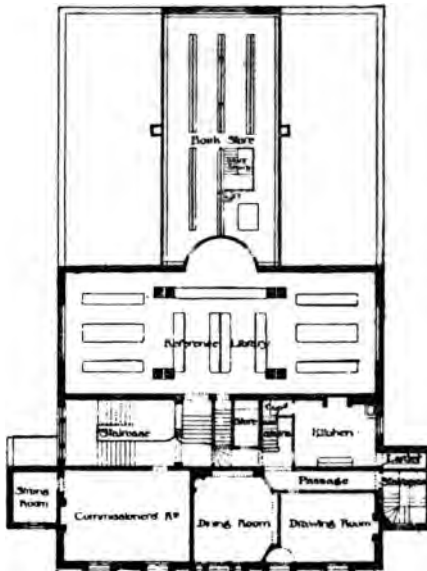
Plan of first floor of the Chelsea Central Library.
